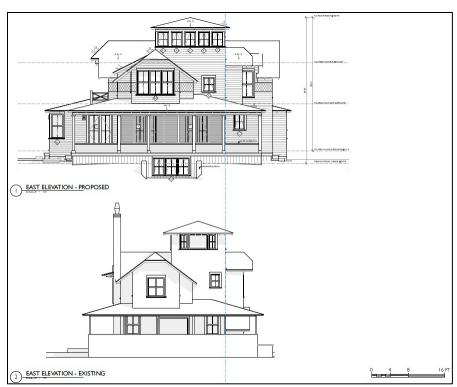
06.14.2022, East Elevation, Existing and Proposed (sullivan + associates architects).
